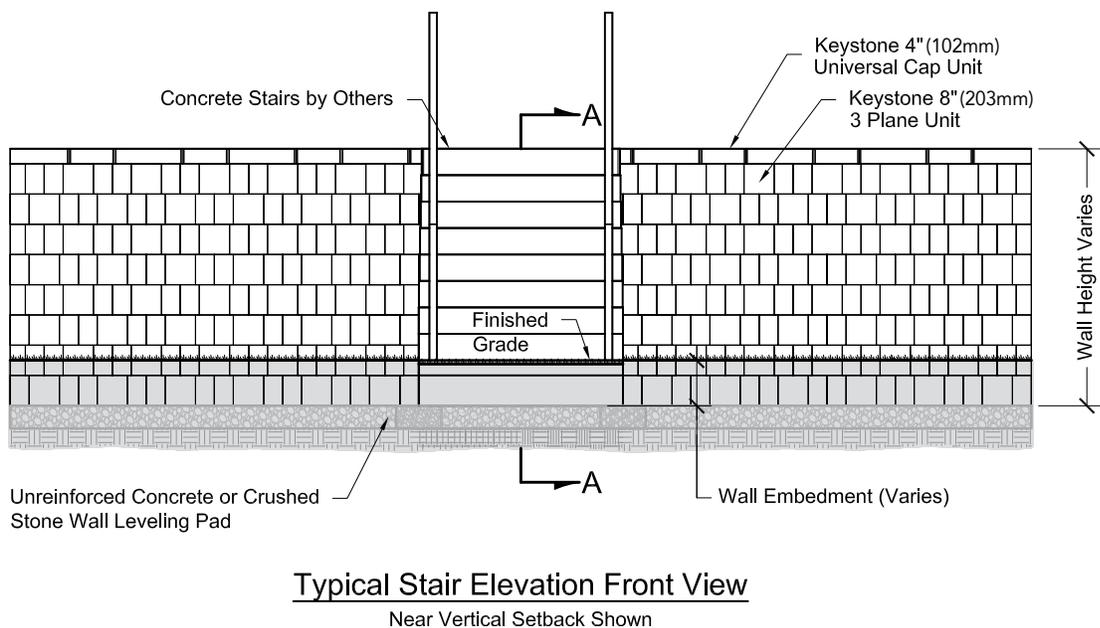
STAIR IN FRONT OF WALL DETAIL ELEVATION
